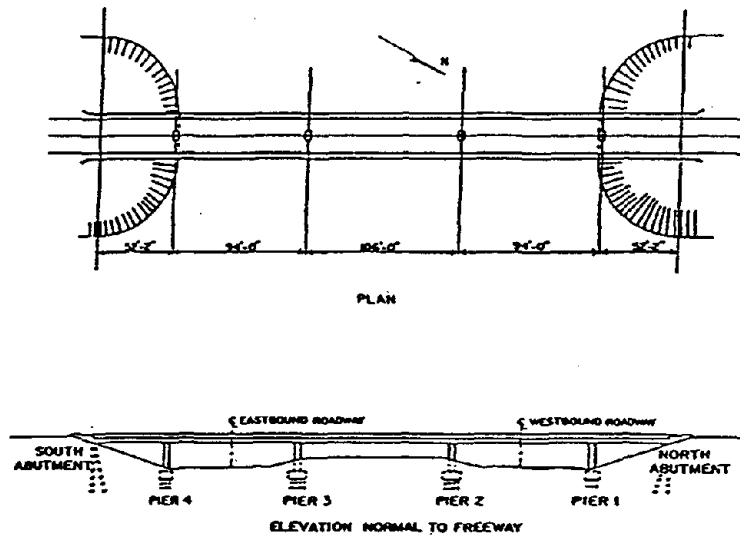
Plan View and Elevation of the Rose Creek Bridge
